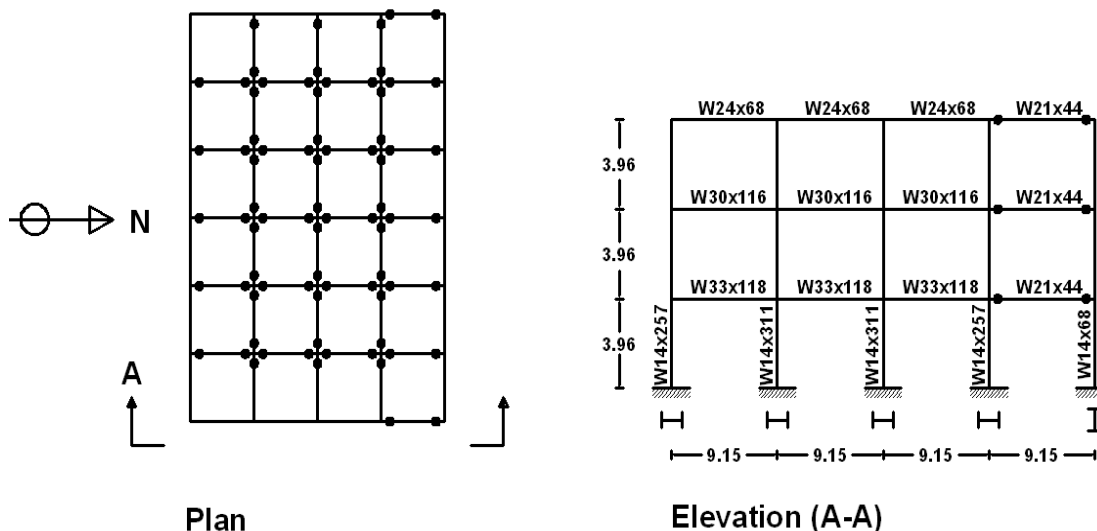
Plan and elevation of 3 story nonlinear benchmark building.
